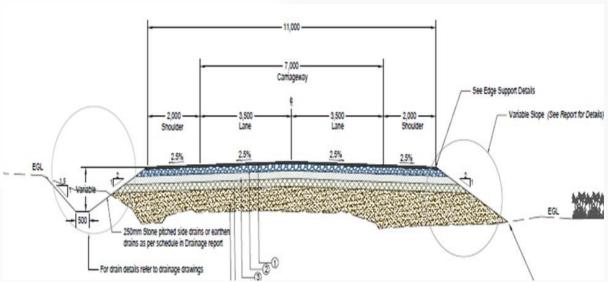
Rural Cross Section (Type 1; as shown in Table 16)
